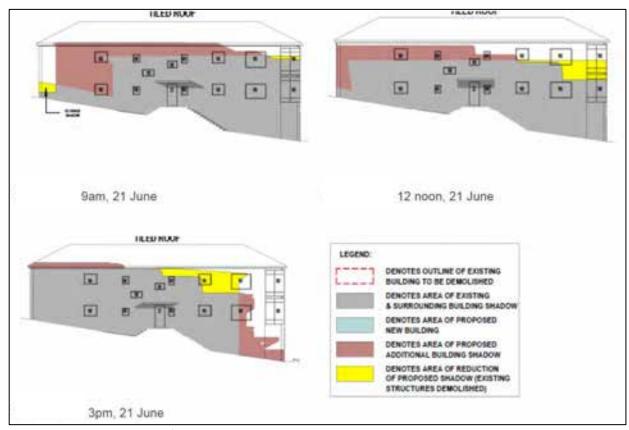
Elevation plan of existing and proposed sunlight access to the adjacent property at No. 156 Ramsgate Avenue
